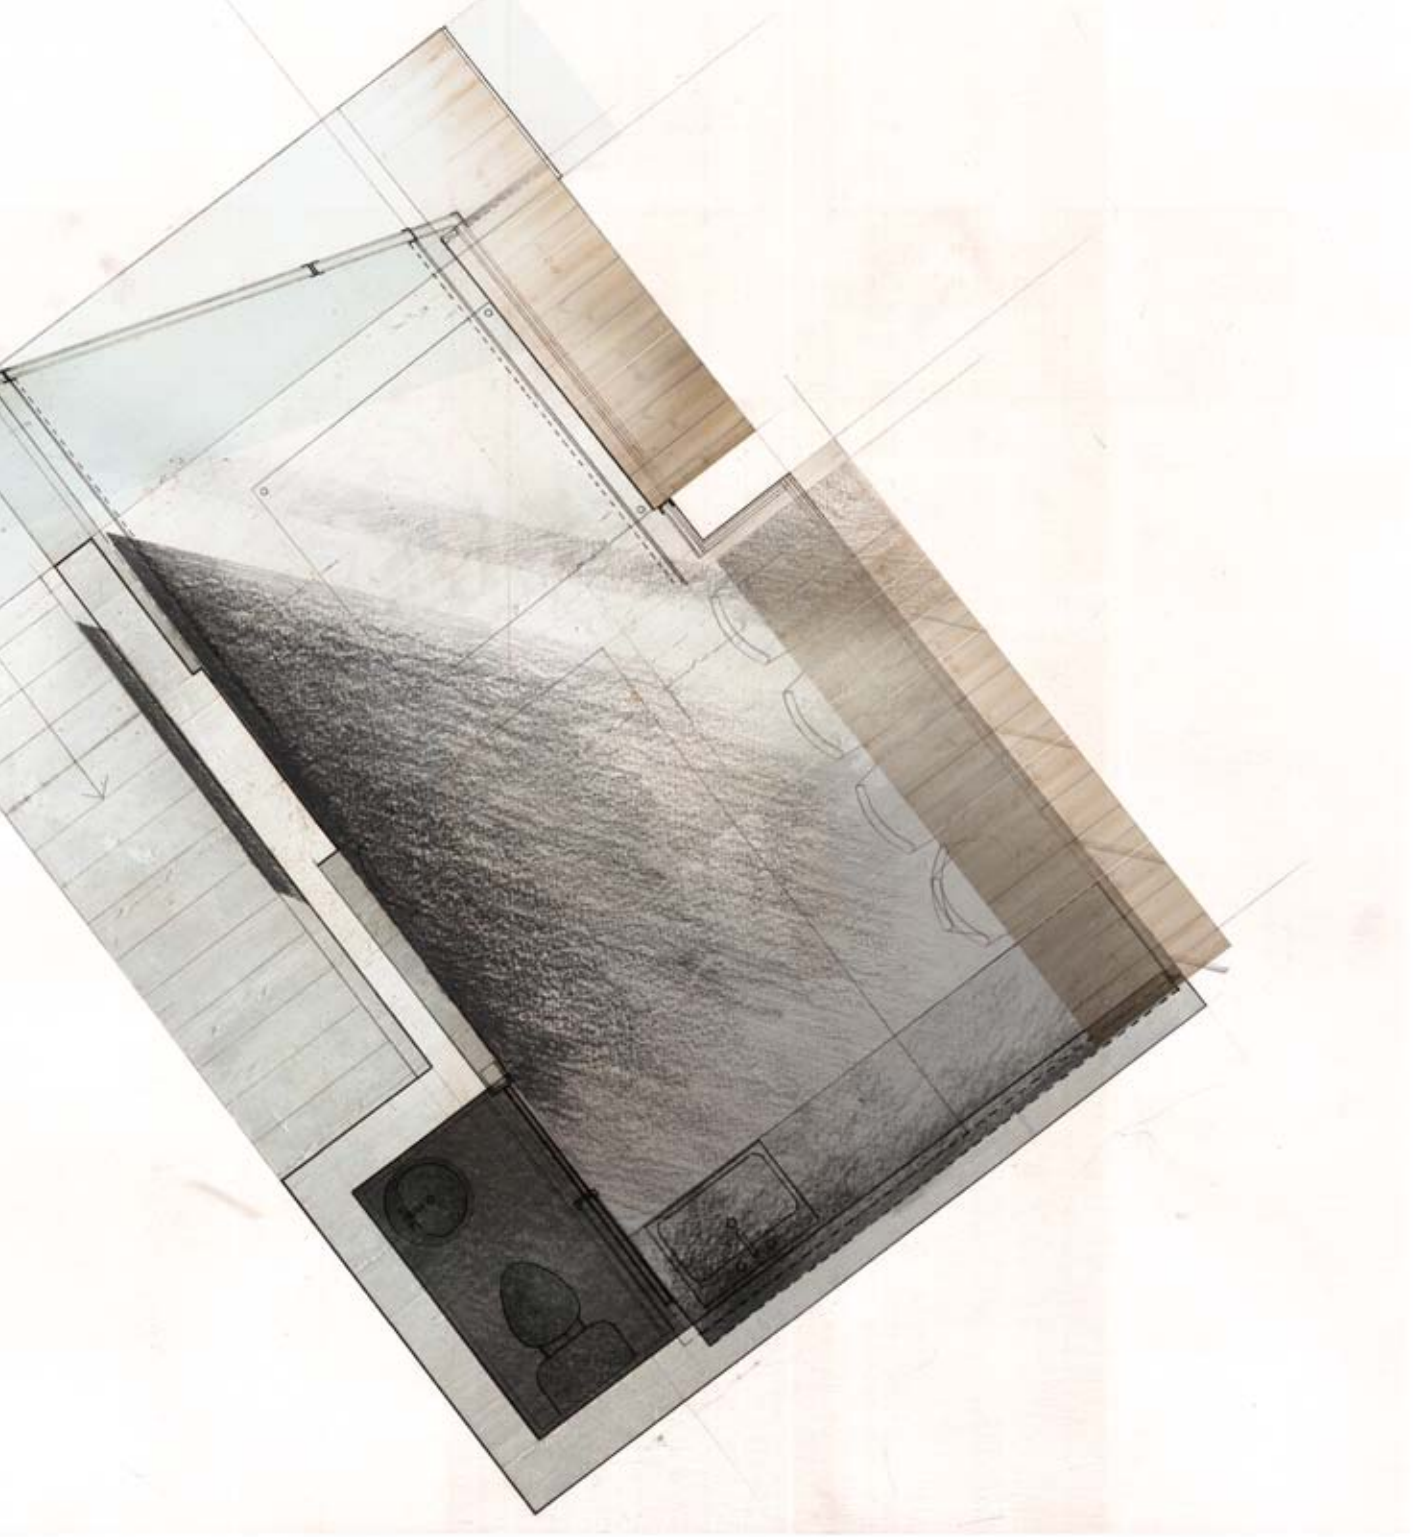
Upper floor plan presented at 3.30 pm illustrating the movement of panels, glazing and wall systems to inform new spatial requirements, interior public blurring and interior/ exterior blurring. Created by Author. Hand drawn (1:20 @ A2) and digitally composed.
